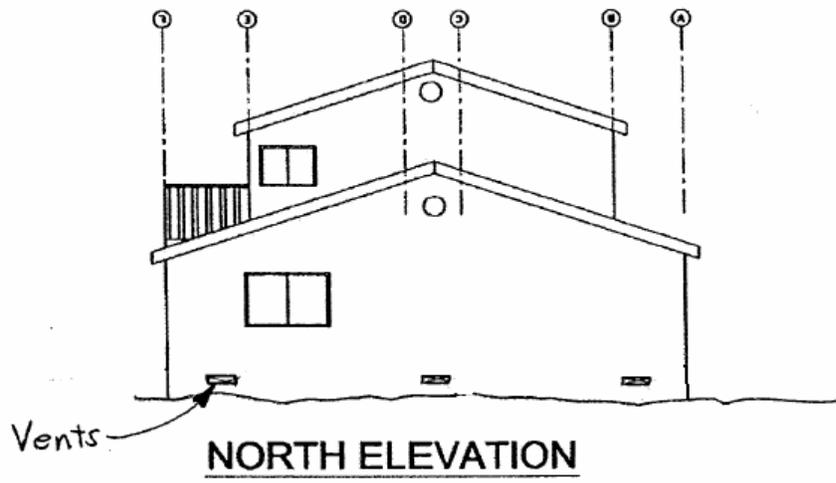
Index building 4 exterior elevations (sheet A2, left)
